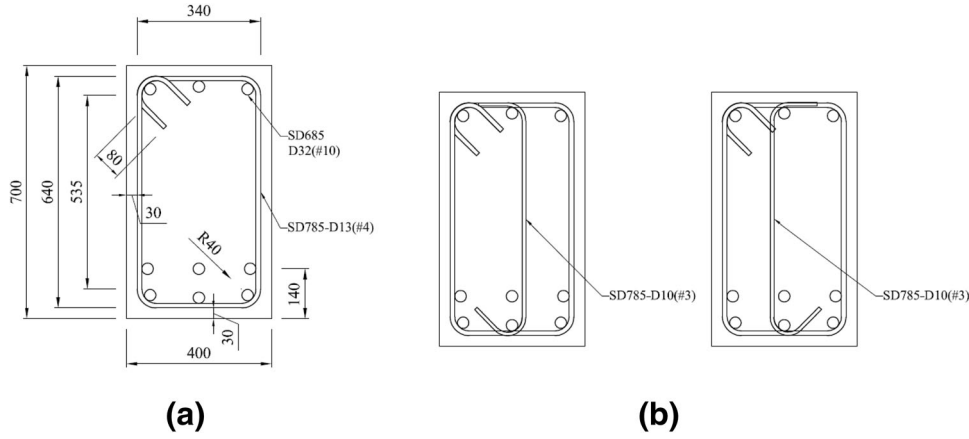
Detailed reinforcement arrangement of the specimen sections. a 3C15S and b 3C20T.
